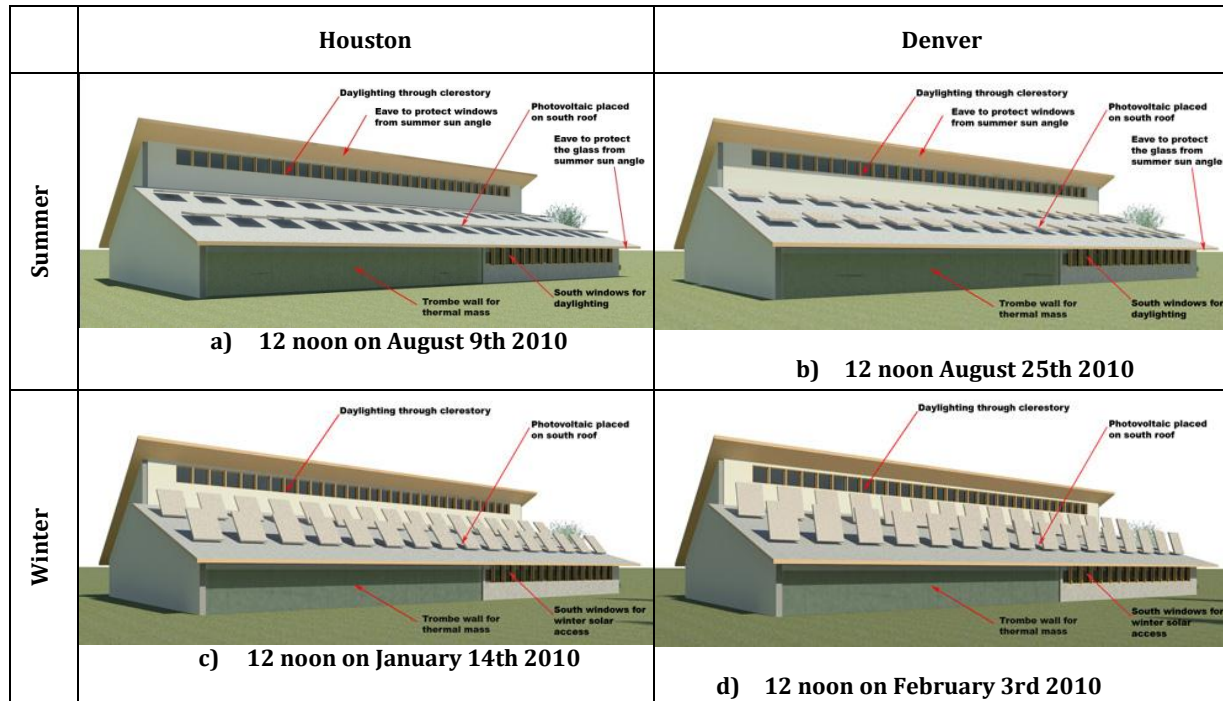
High Performance Building over the site with Tromb  Wall + South Windows +North Windows + Clerestory + DHW
